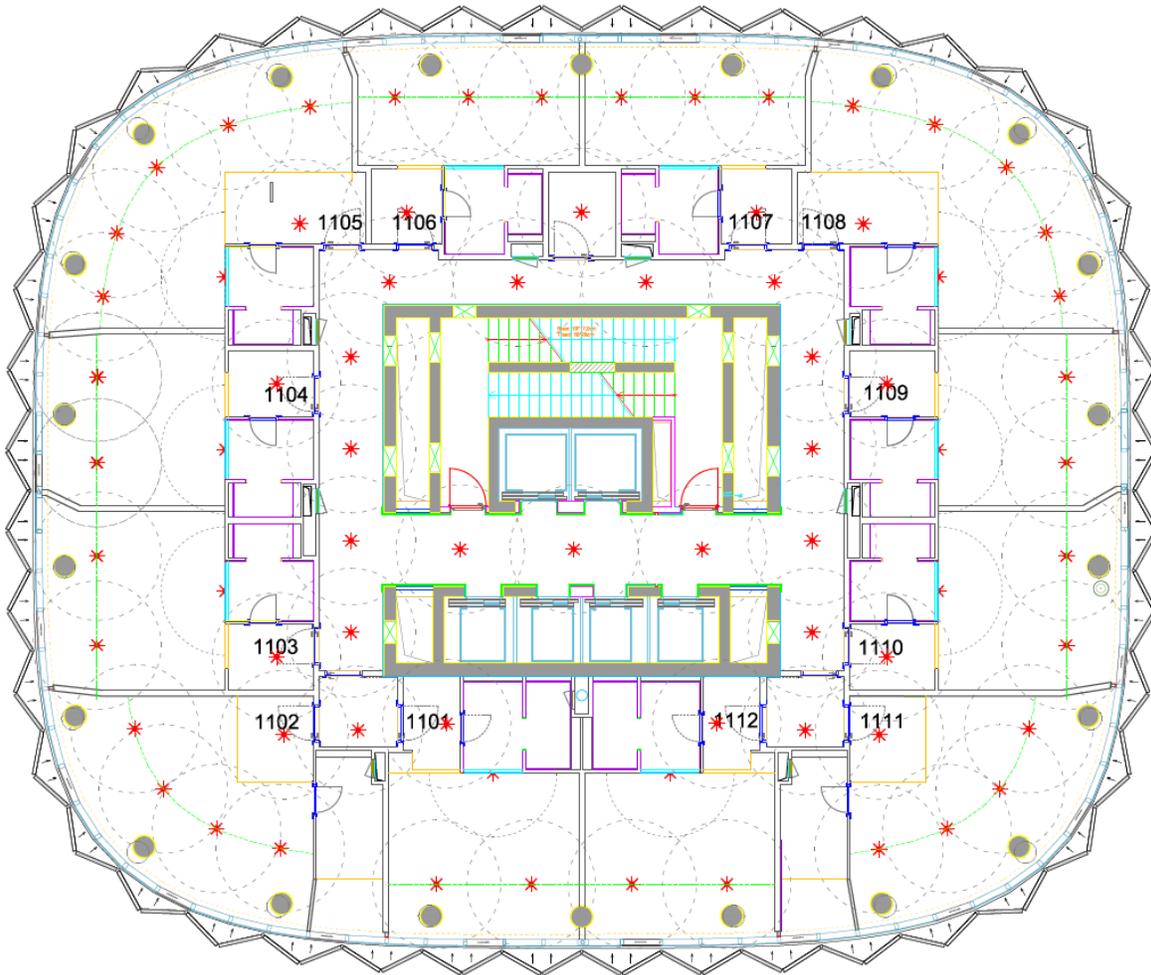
Guestroom floor layout sprinkler distribution on ceiling and on the wall [TID archive, 2016]
